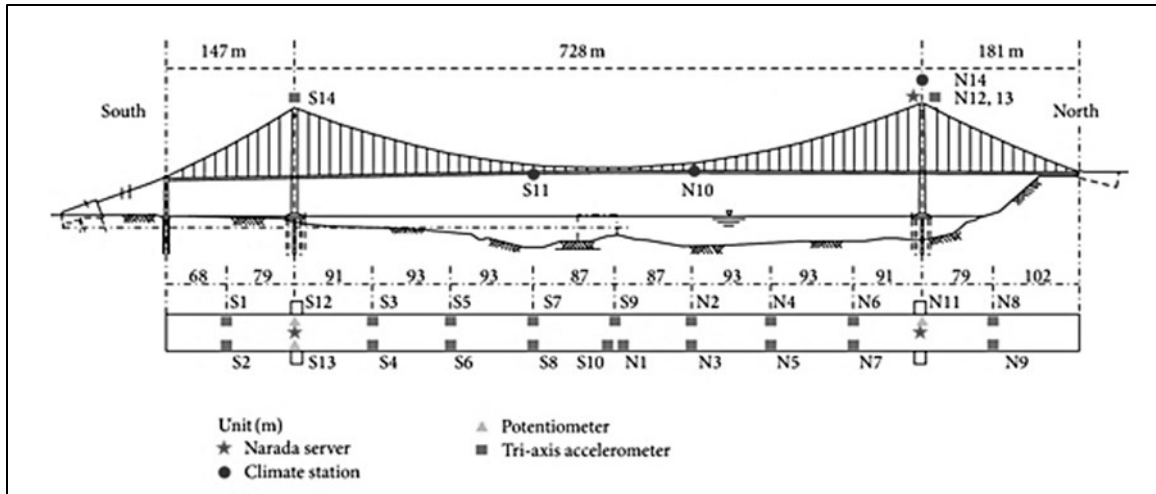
2: Layout of WSN on the New Carquinez Bridge (Kurata et al. 2013)
